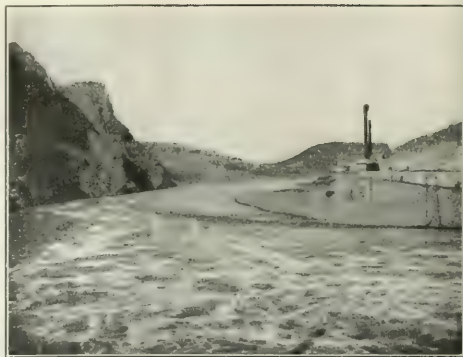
RIO CONCHOS IN FLOOD—STEAM-ELECTRIC CONSTRUCTION PLANT IN DISTANCE
